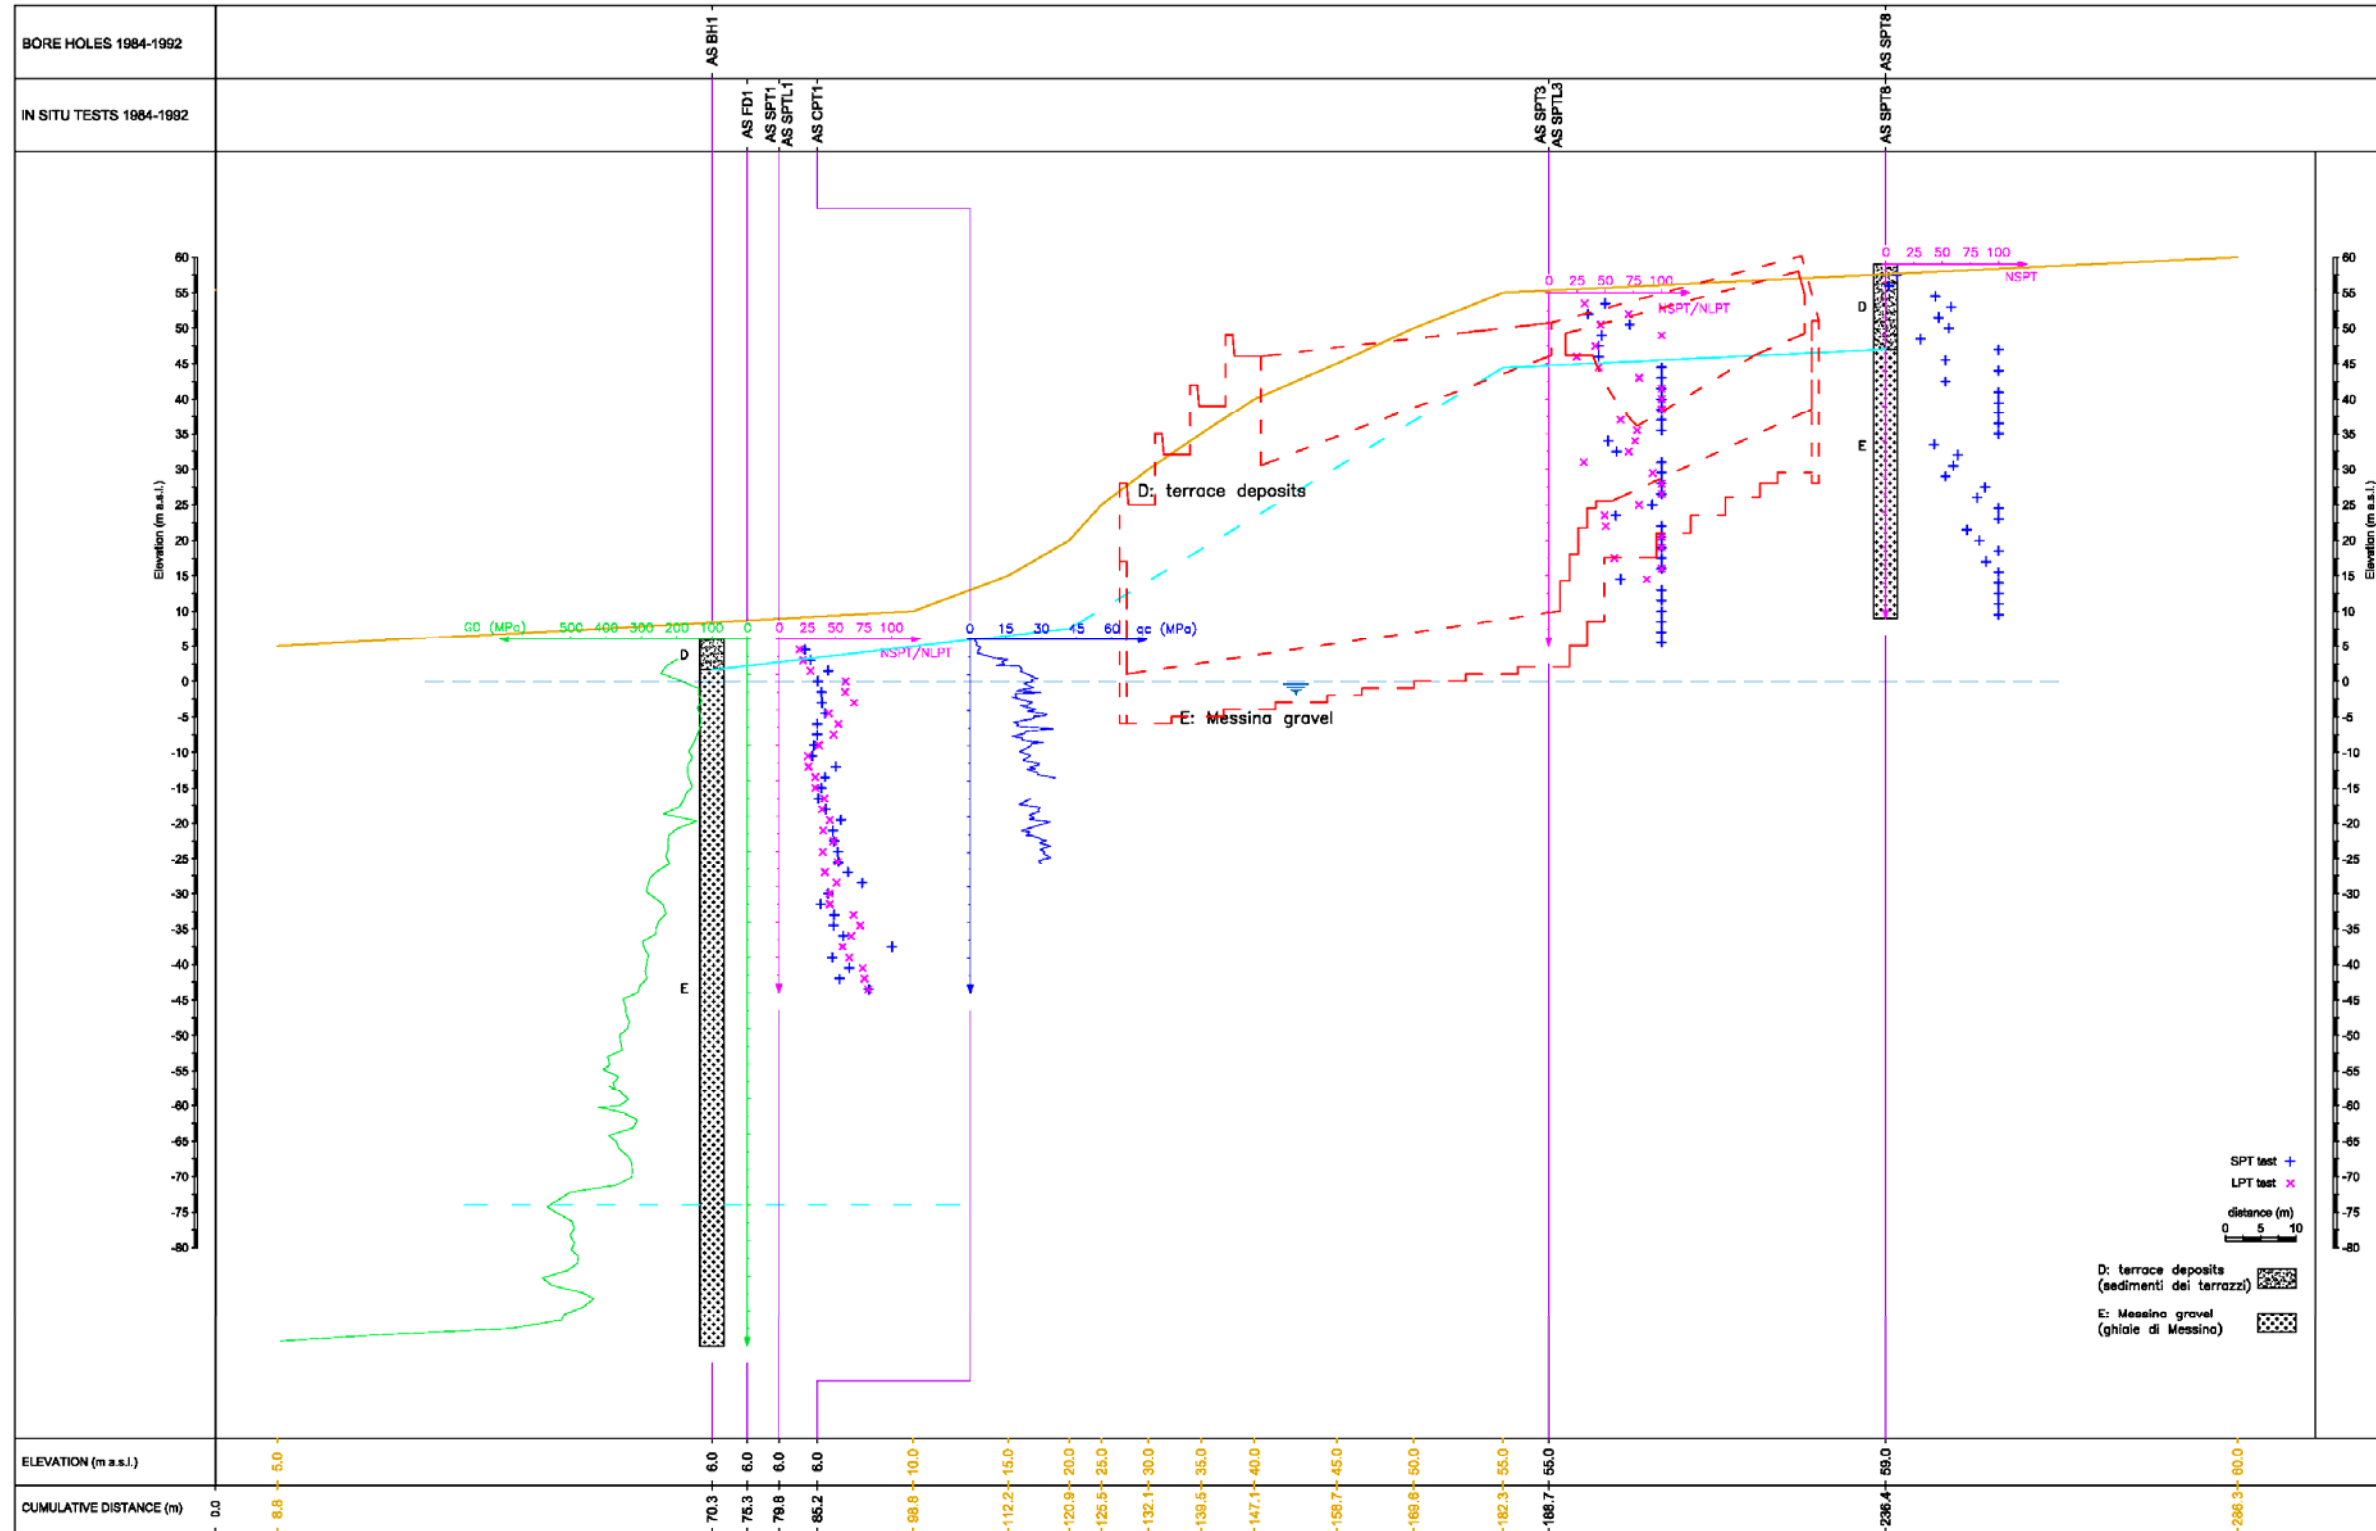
Sicily Anchor Block, longitudinal section (Section No. 3)
